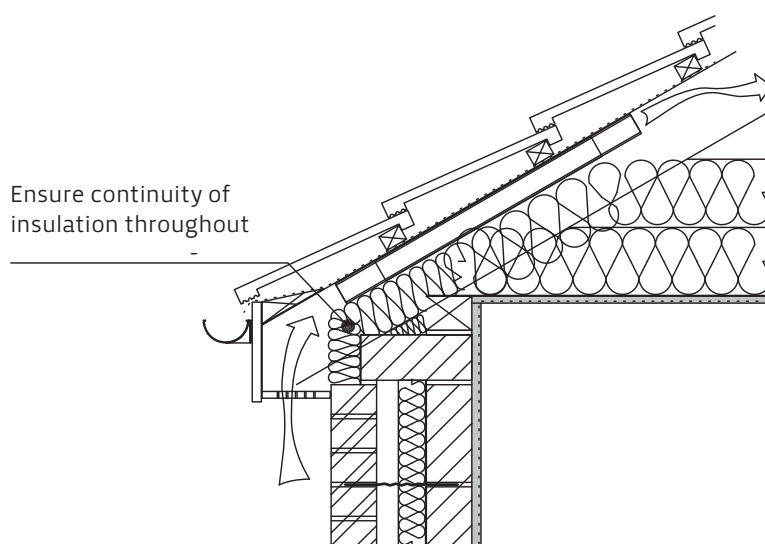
Cavity wall insulation - Eaves detail (Ventilated roof space)
